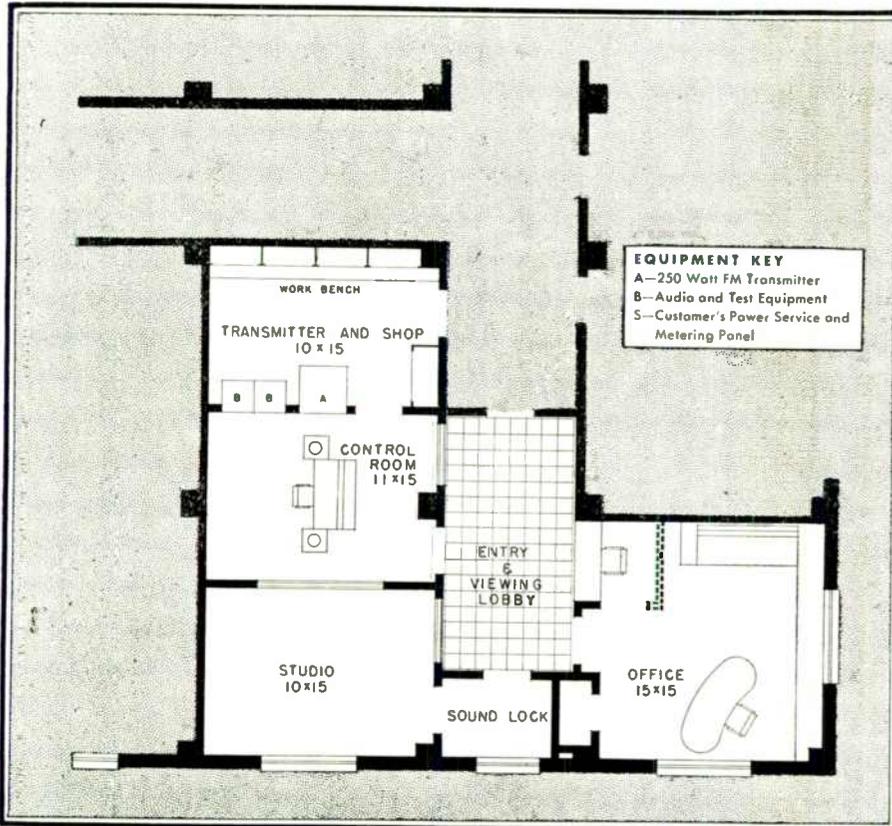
PLAN FOR THE ARRANGEMENT IN FIG. 1, FOR OFFICE BUILDING LOCATION
